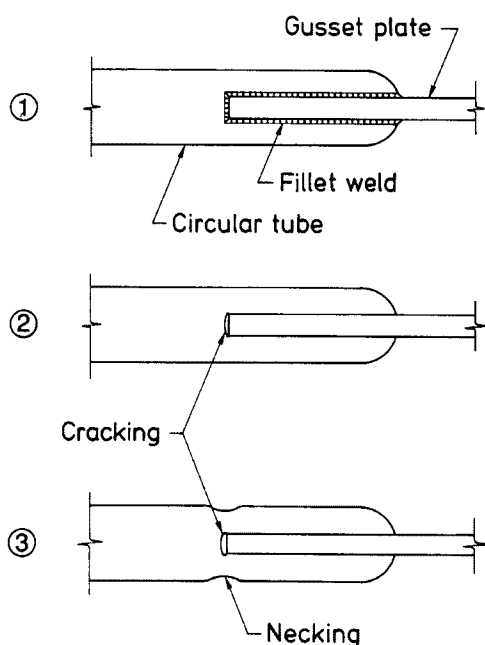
Rupture of a circular tube due to an expanding crack in the welding zone.
